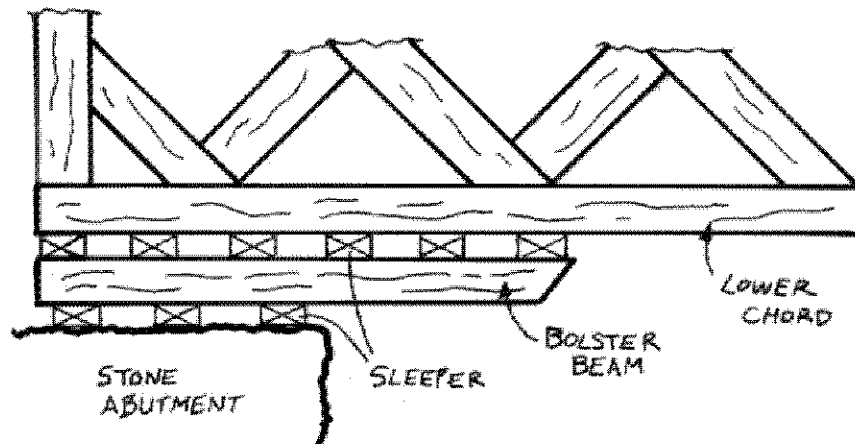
Typical Arrangement of Bolster Beam and Sleepers of Brown Bridge.
